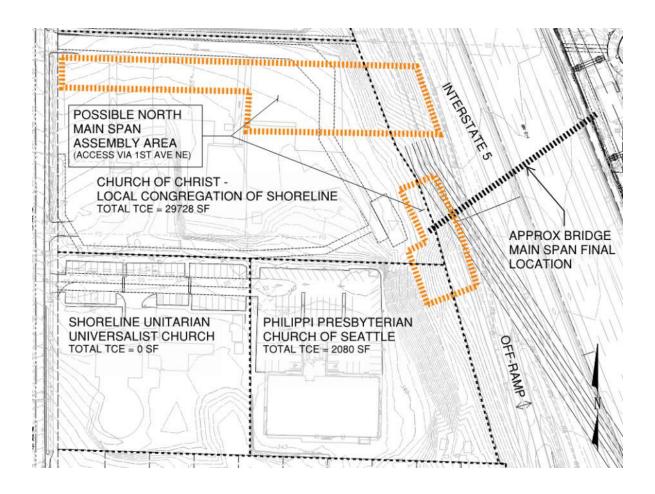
Potential Bridge Construction Staging Area on Church of Christ Parcel
